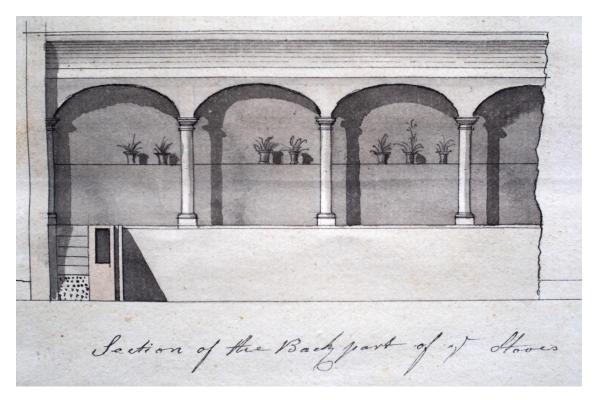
DETAIL OF THE 1758 STOVE PLAN SHOWING THE ARCH COLONNADE AND SHELVES FOR PLANTS TO BE EFFECTIVELY DISPLAYED IN POTS (BURTON CONSTABLE HALL, 1758)
